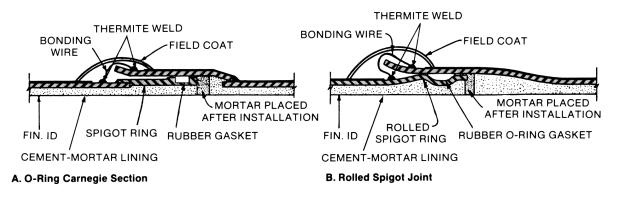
Bonding wire for bell and spigot rubber-gasketed joint
